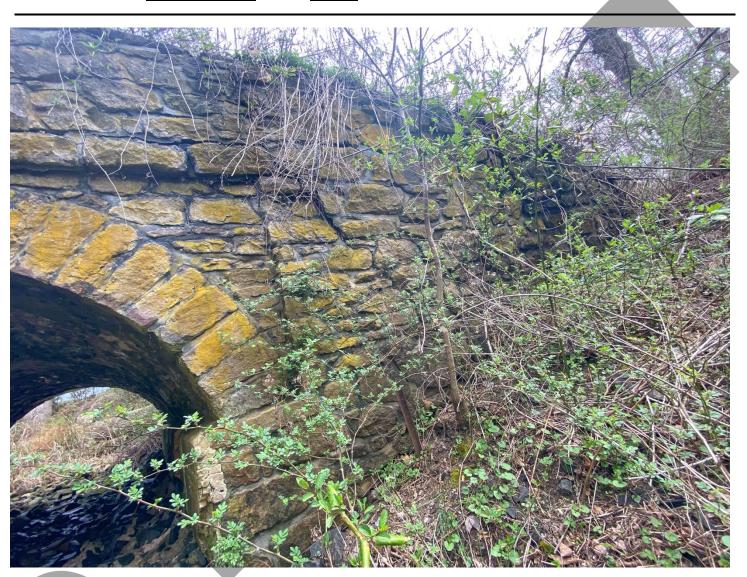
Southwest (downstream) side of the bridge, View facing northwest showing the southeast wingwall
